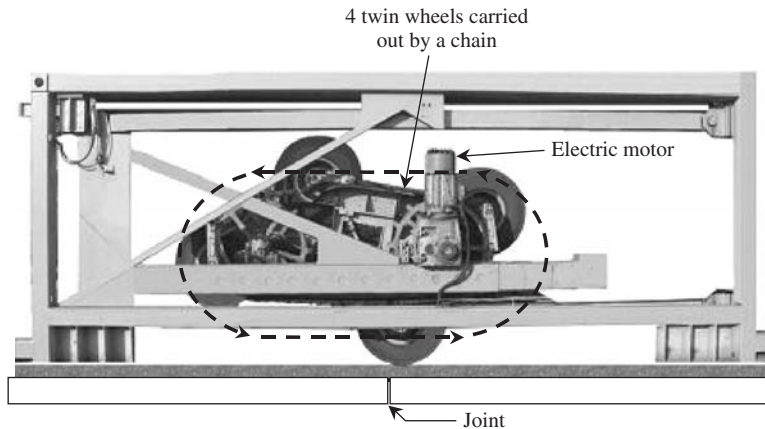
APT equipment used for reflective cracking test on full scale pavement structures at the LCPC.
